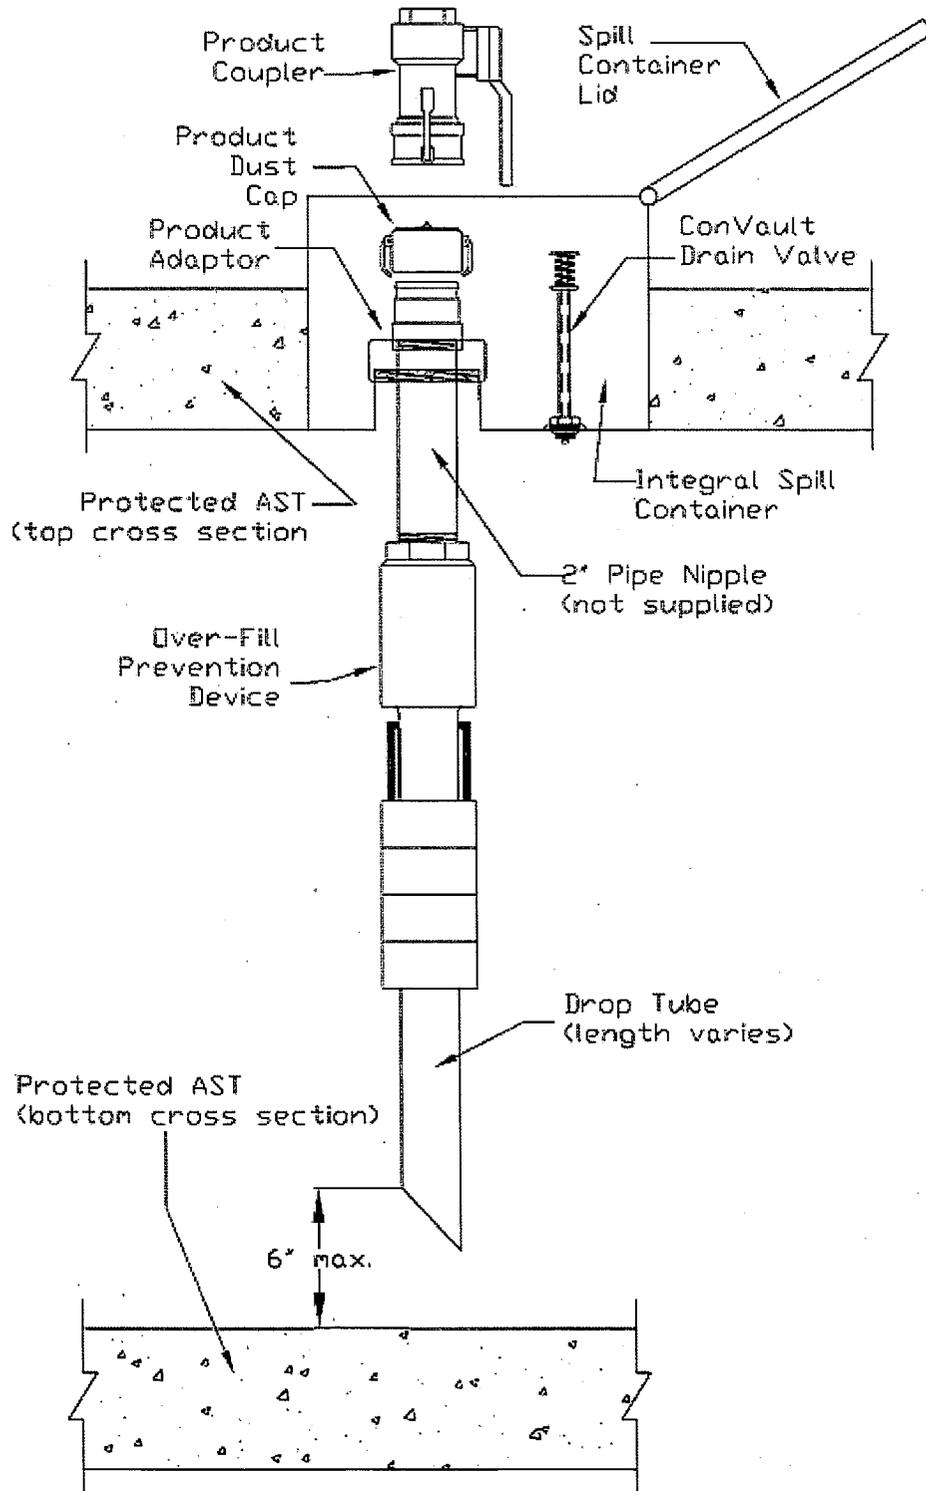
Typical "Product Side" Assembly Drawing for ConVault Integral Spill Container with Drain Plug
